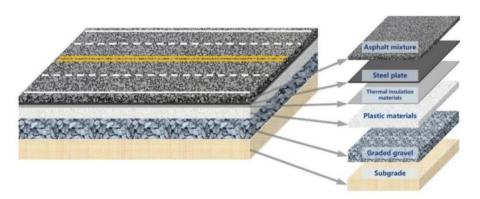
Typical pavement and ASP pavement (Jiang et al., 2021a).
